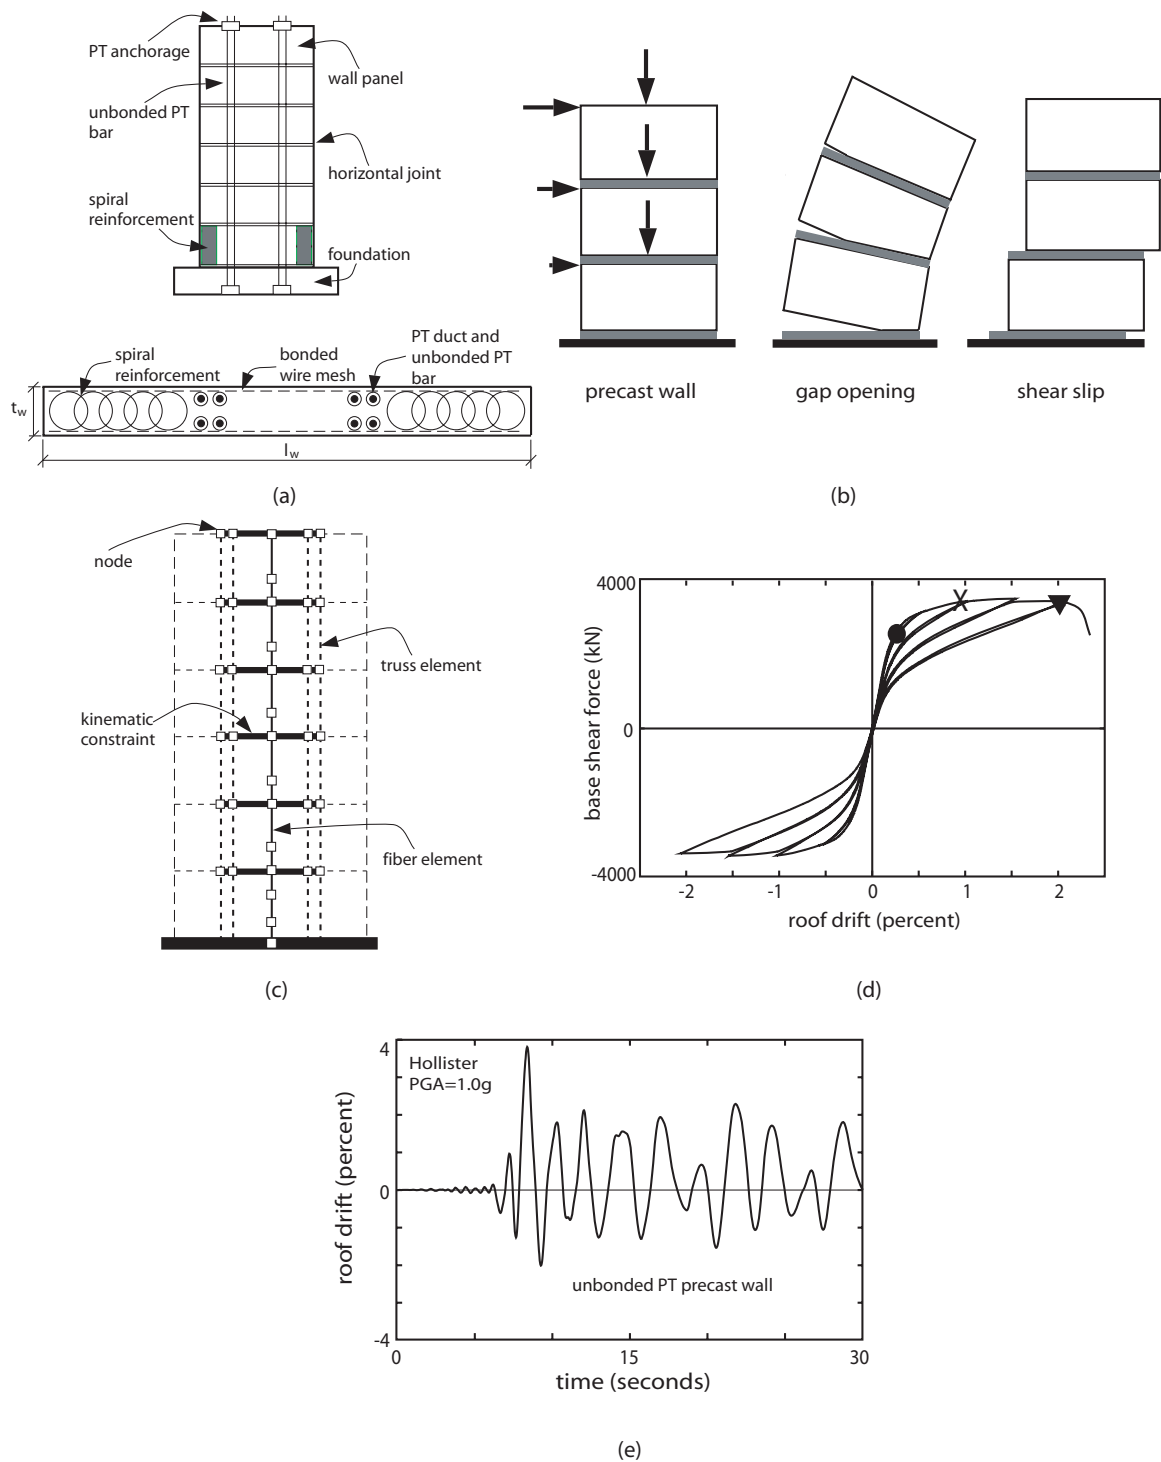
Unbonded post-tensioned precast concrete walls (adapted from Kurama et al. 1999a): (a) wall elevation and cross-section; (b) gap opening and shear slip behavior; (c) analytical model; (d) behavior under cyclic lateral loads; (e) dynamic response
